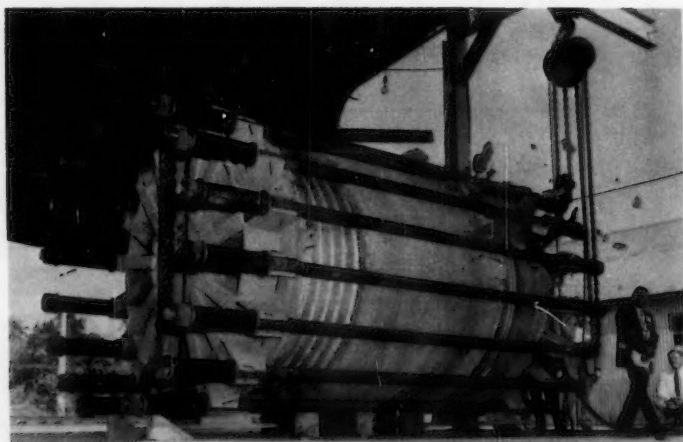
FAILURE OF PIPE NO. 1840 UNDER HYDROSTATIC TEST PRESSURE OF 605 PSI
